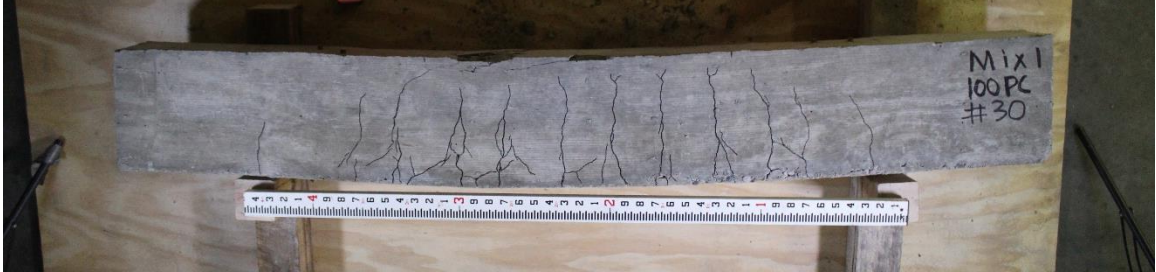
Mixture 1 (100PC) beam #30: concrete beam side view.
